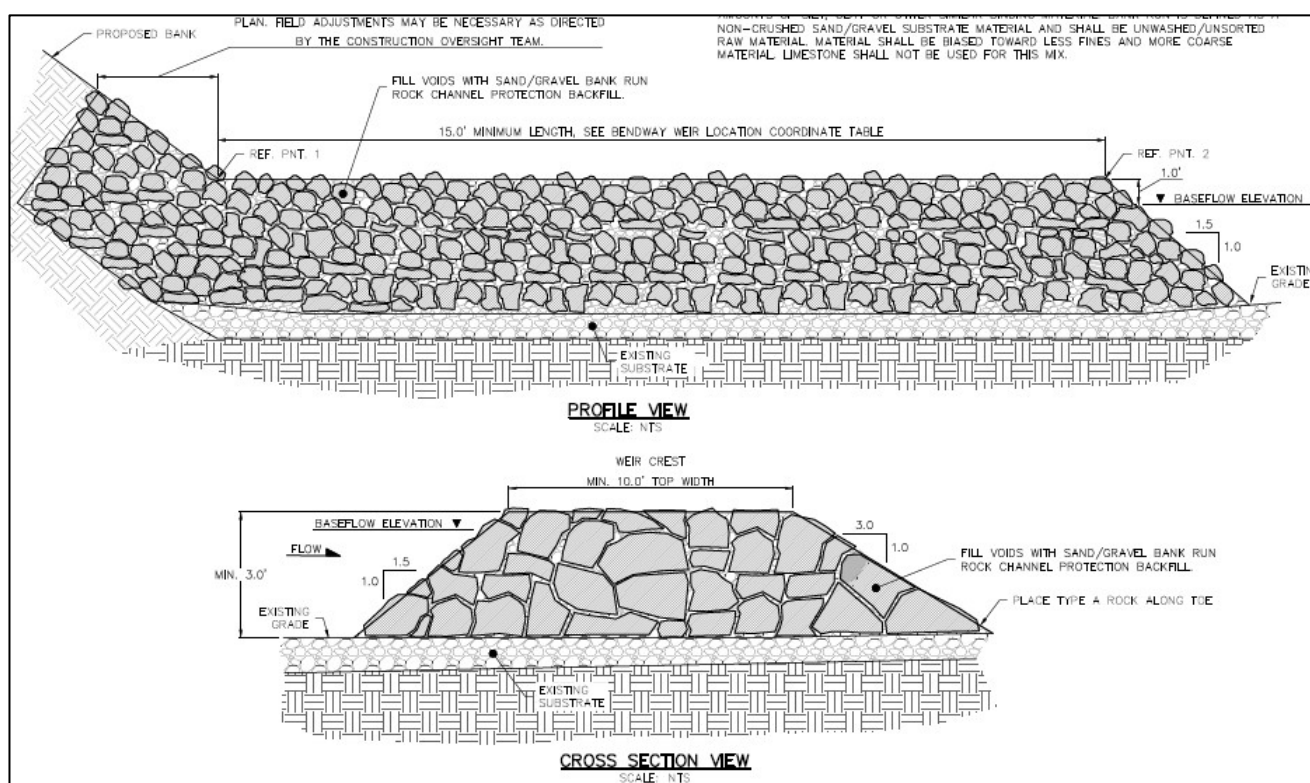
Bendway Structure Details. The structure is 3 feet high, 20 feet wide, and will extend more than 15 feet out into the river.
